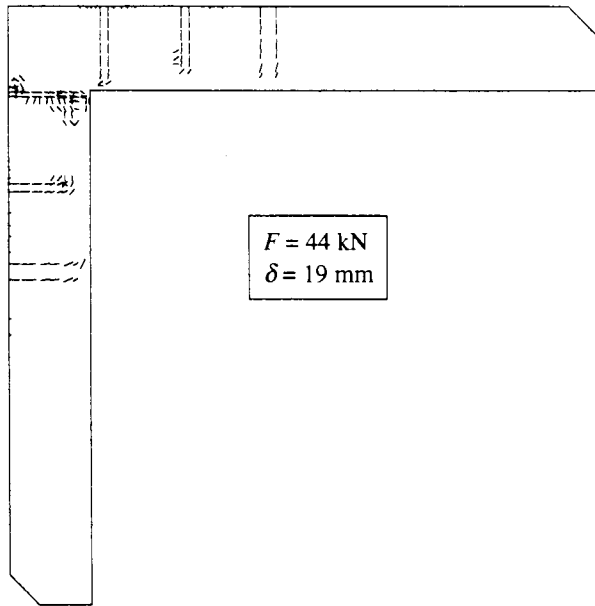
Crack pattern at the end of the analysis for a frame corner with the new reinforcement detailing when assuming "other" bond condition.
